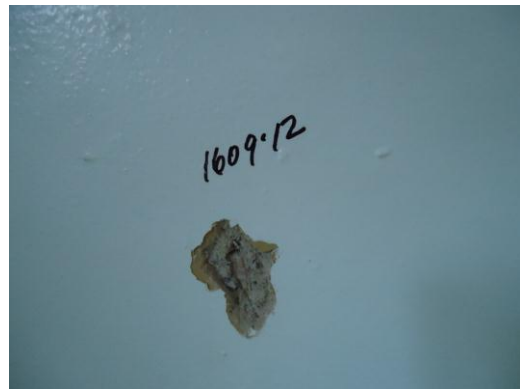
Wall Plaster (1609-12) Kitchen East Wall. No Asbestos Detected.
